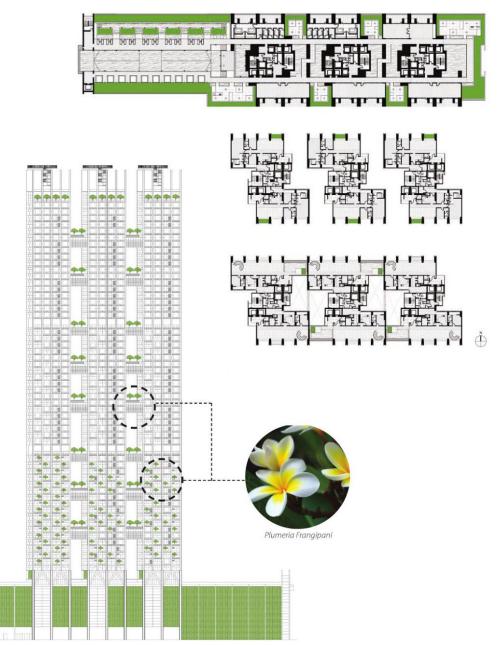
Plan and Elevation showing greenery location (CTBUC, 2014)
